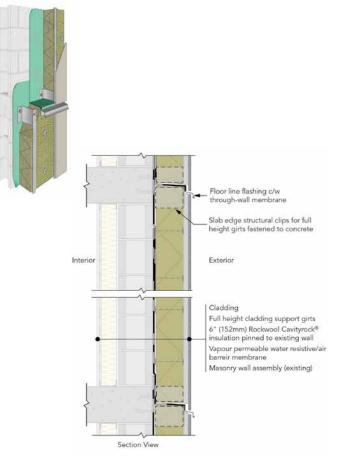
ROCKWOOL Cavityrock between a Z-girt clip system, installed over an existing CMU structure, attached through the concrete slab
